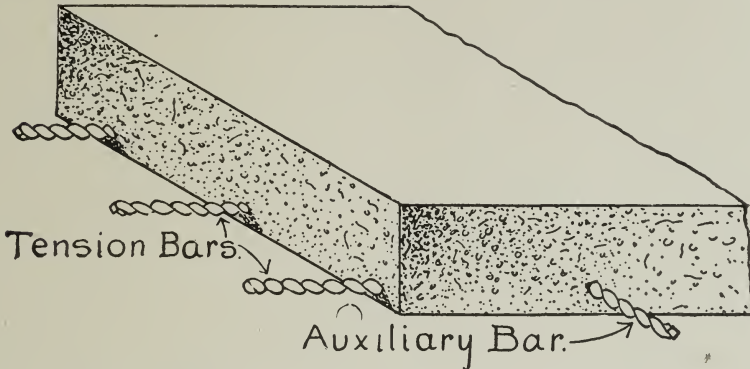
Ransome Reinforced Concrete Floor. Early Flat Form.
